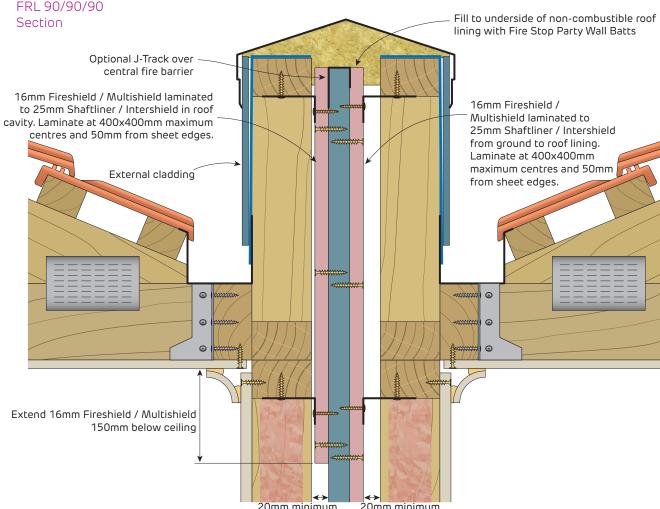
Interhome Wall to Parapet Roof with Perpendicular Roof Trusses
